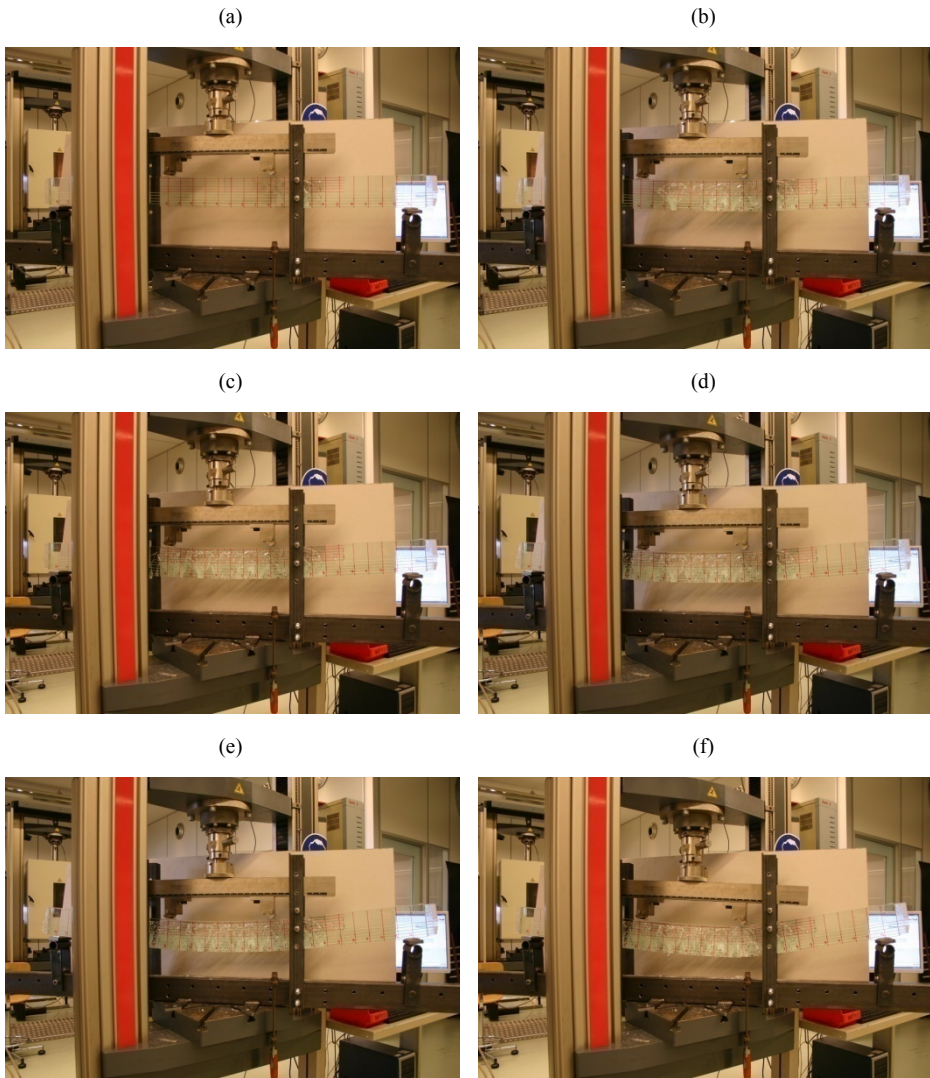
Photo sequence of an exemplary bending test on a 1.5 m SG-laminated GFRP-reinforced glass beam, with round reinforcement rods.
